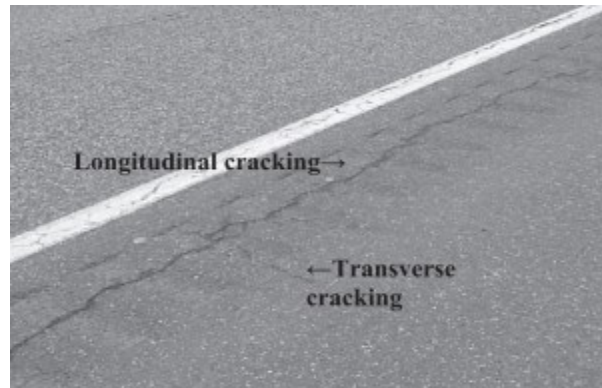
Transverse and longitudinal cracking at milled rumble strips (Coffey and Park, 2016)
